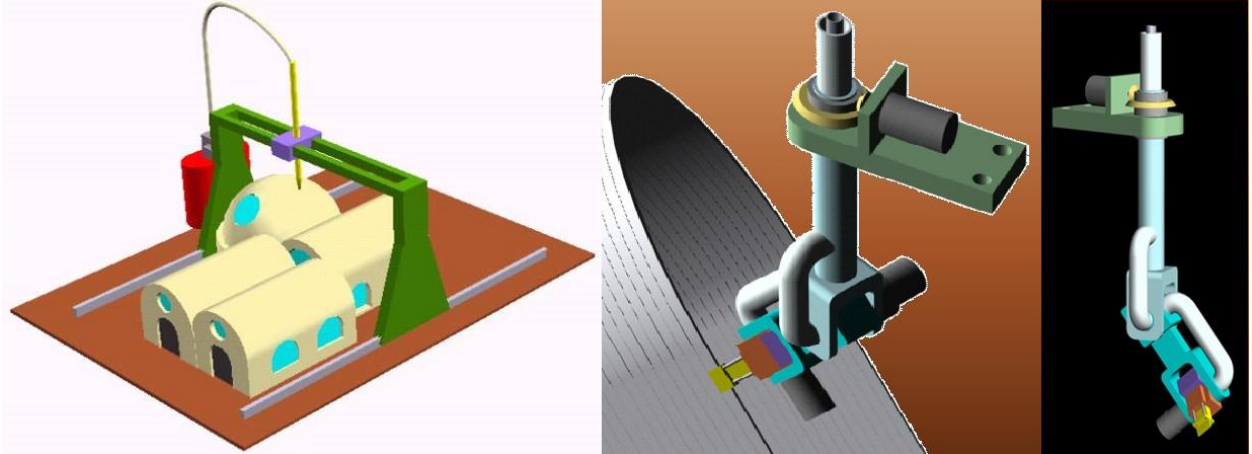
Robot for Constructing Cradle (Arched) Roofs and a Robot for Building Traditional Houses Using Traditional Materials
